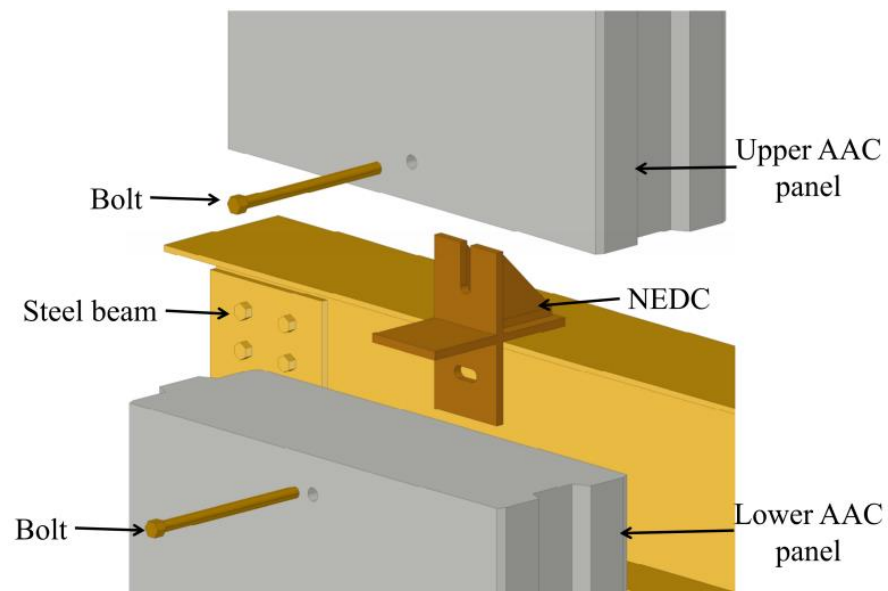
Schematic of NEDC connecting the upper and lower AAC wall panels.
